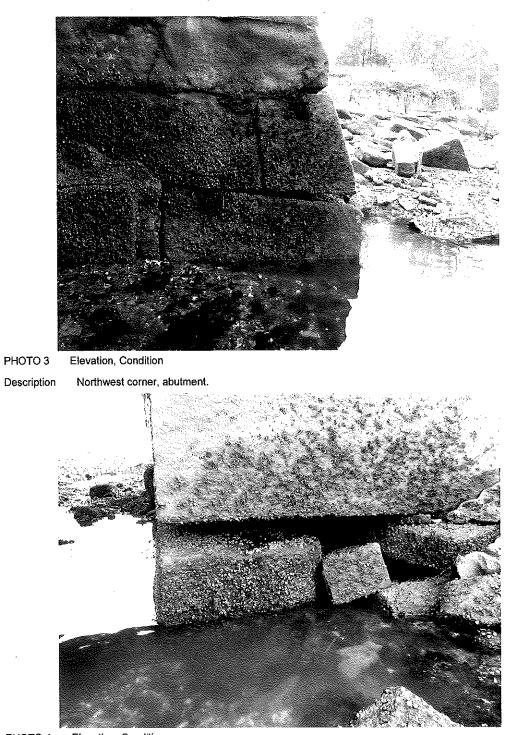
Elevation, Condition Northwest corner, wingwall.
